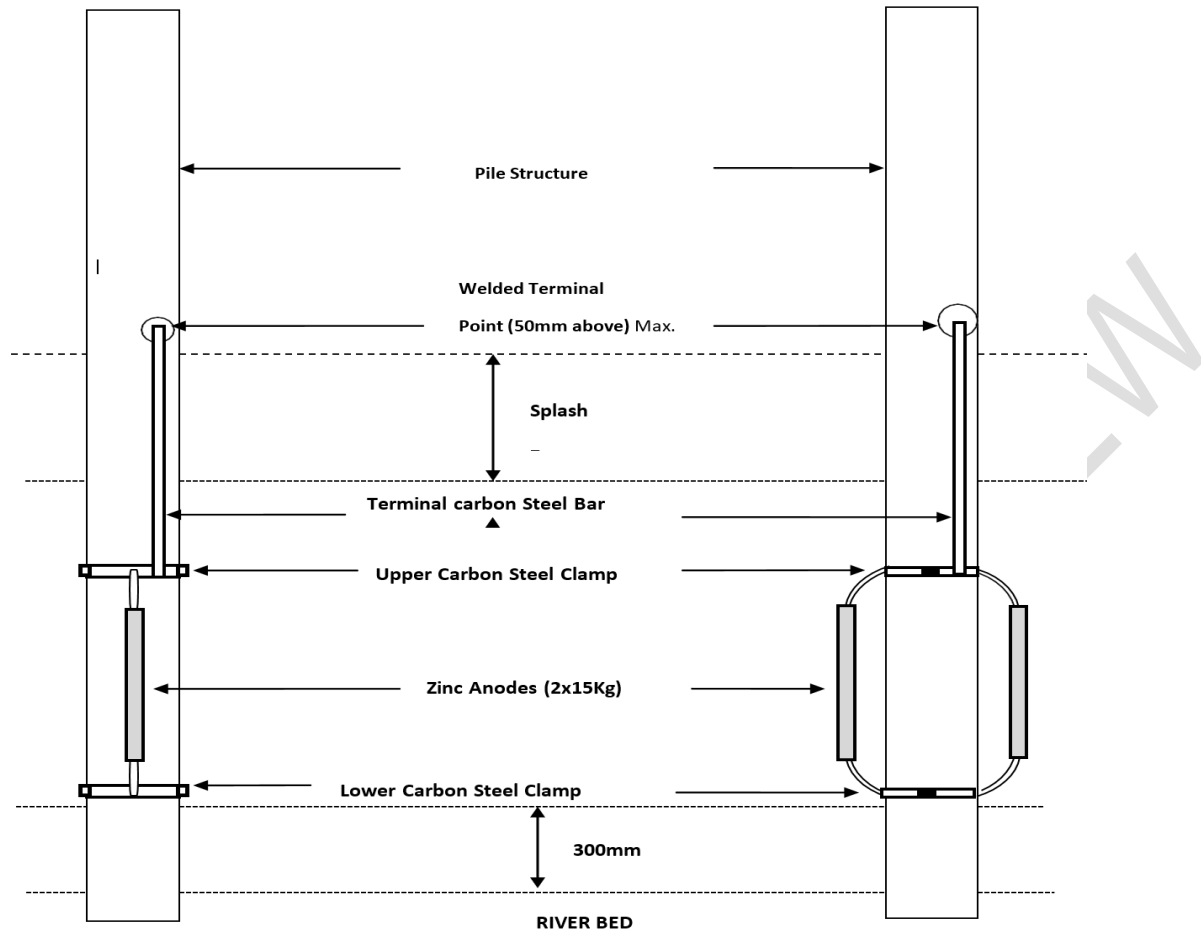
Layout/Configuration of Anodes on Steel Casing Piles for the 60 m Reinforced Concrete Bridge
